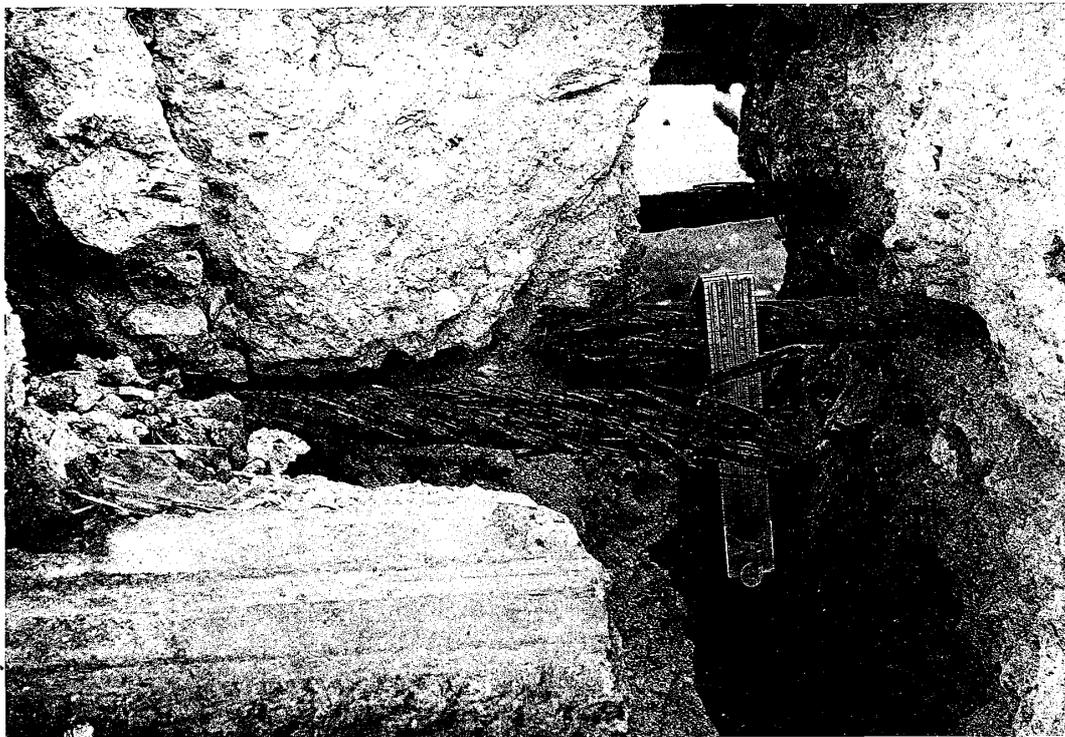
One of the cracks of the basement wall. The steel cable, one inch in diameter, which was embedded in the concrete, was broken.
